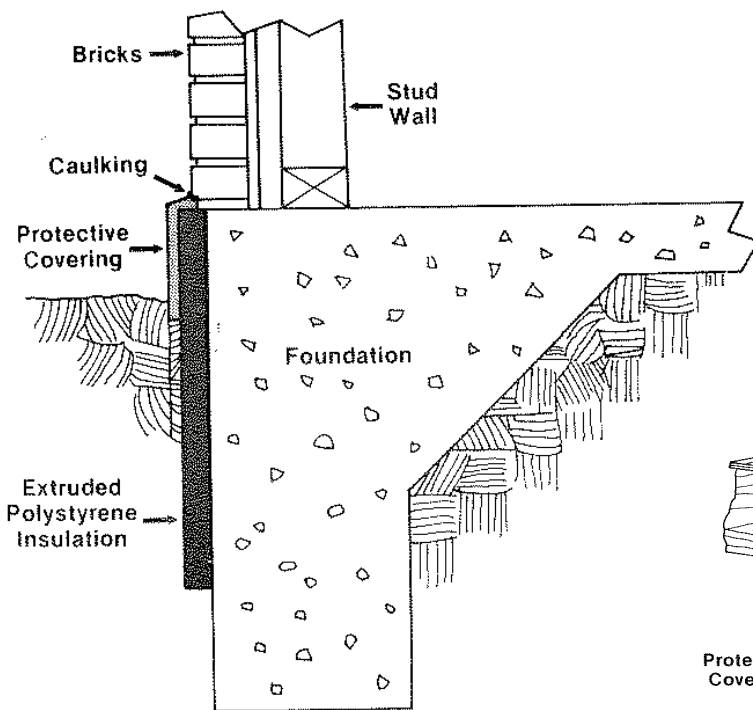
Applying insulation to an exterior foundation wall. (NDSU)
